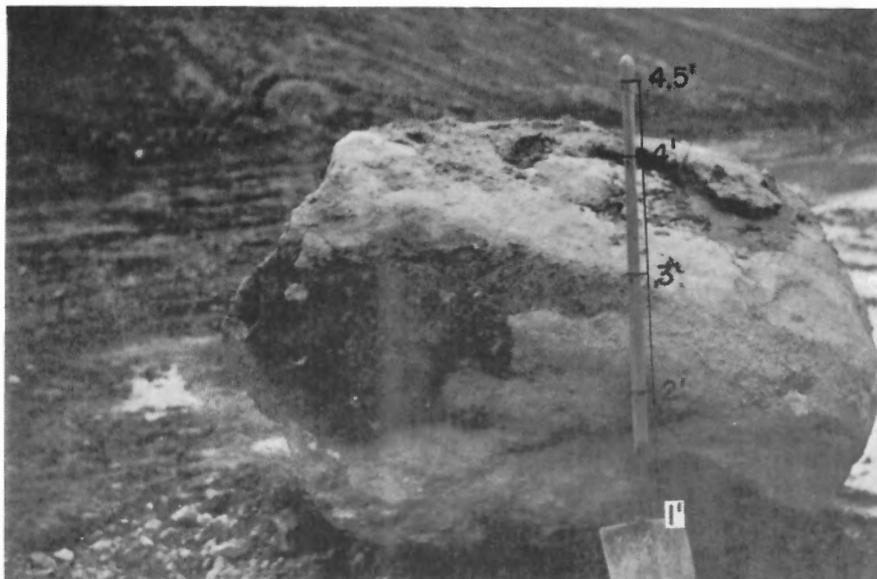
Large limestone boulder that was imbedded in the lower part of the upper till; station 67 + 50, elevation 550 feet, 150 feet east of the centre line. (GSC photo No. 2-4-68)
